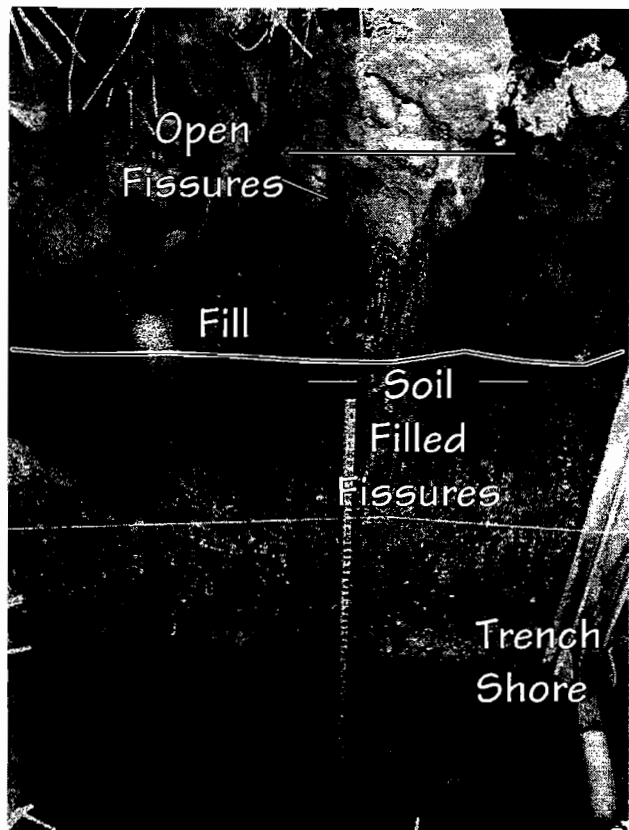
View of south wall of Trench 3 showing open and soil filled fissures. Ruler is 2 m long.
